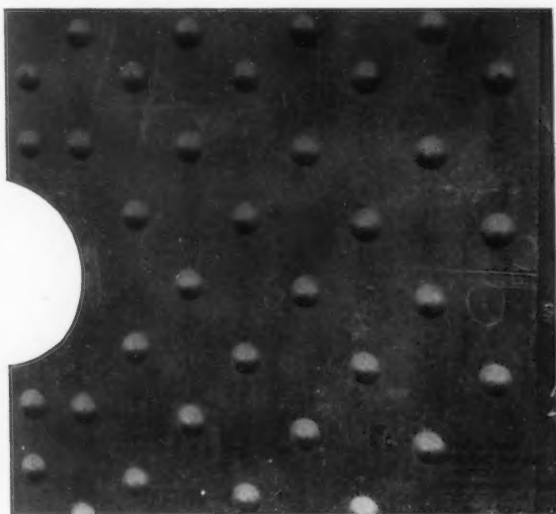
COLUMN NO. 4 AFTER TESTING.
